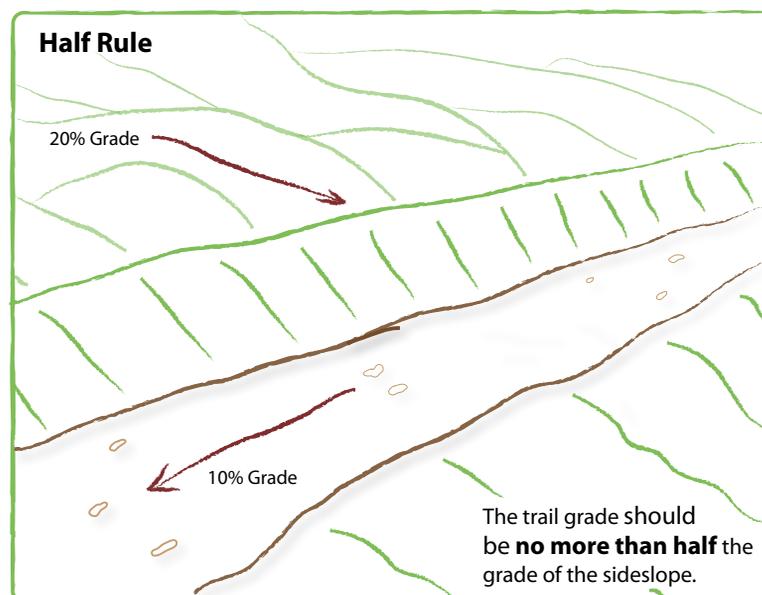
Building trail on gentle cross slopes using the Half Rule helps them to shed water.
